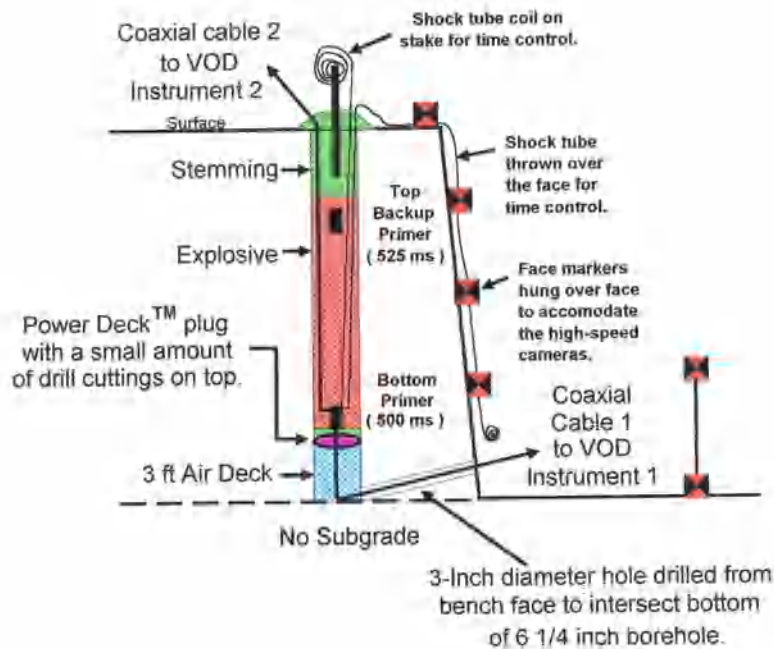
Example of a fully instrumented 6 1/4 inch diameter hole and the smaller intersecting 3 inch cable hole.
